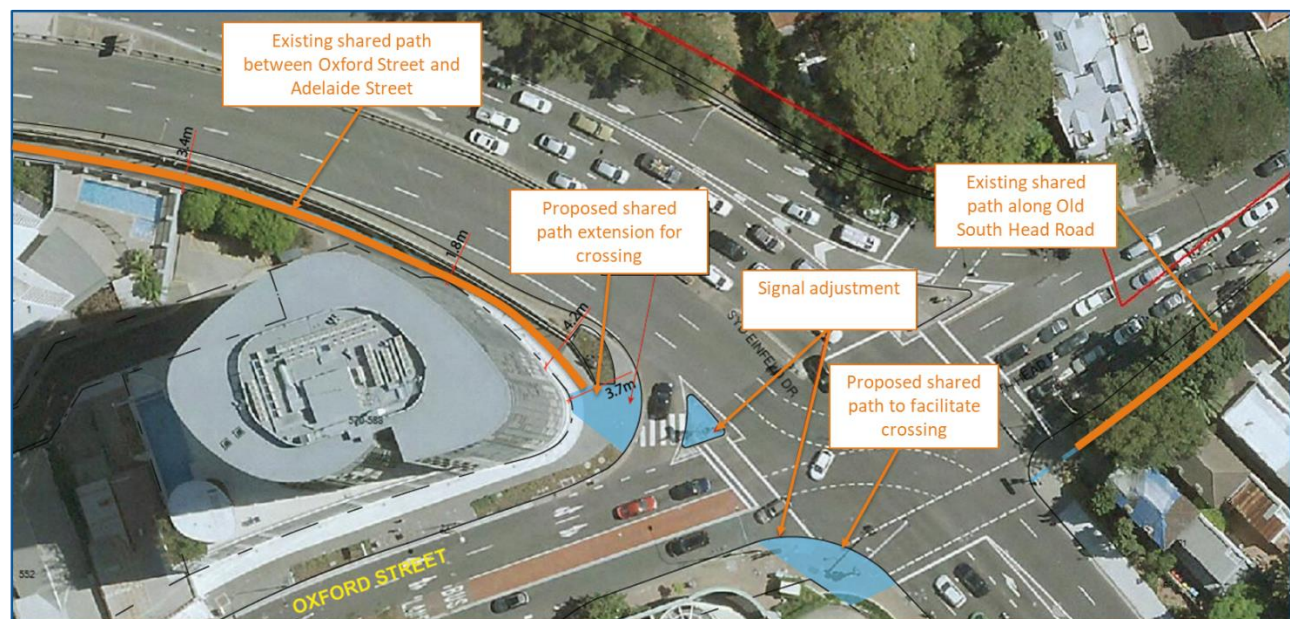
Proposed shared path – Oxford Street/Syd Enfield Drive/Old South Head Road (see Attachment 1 for details).
